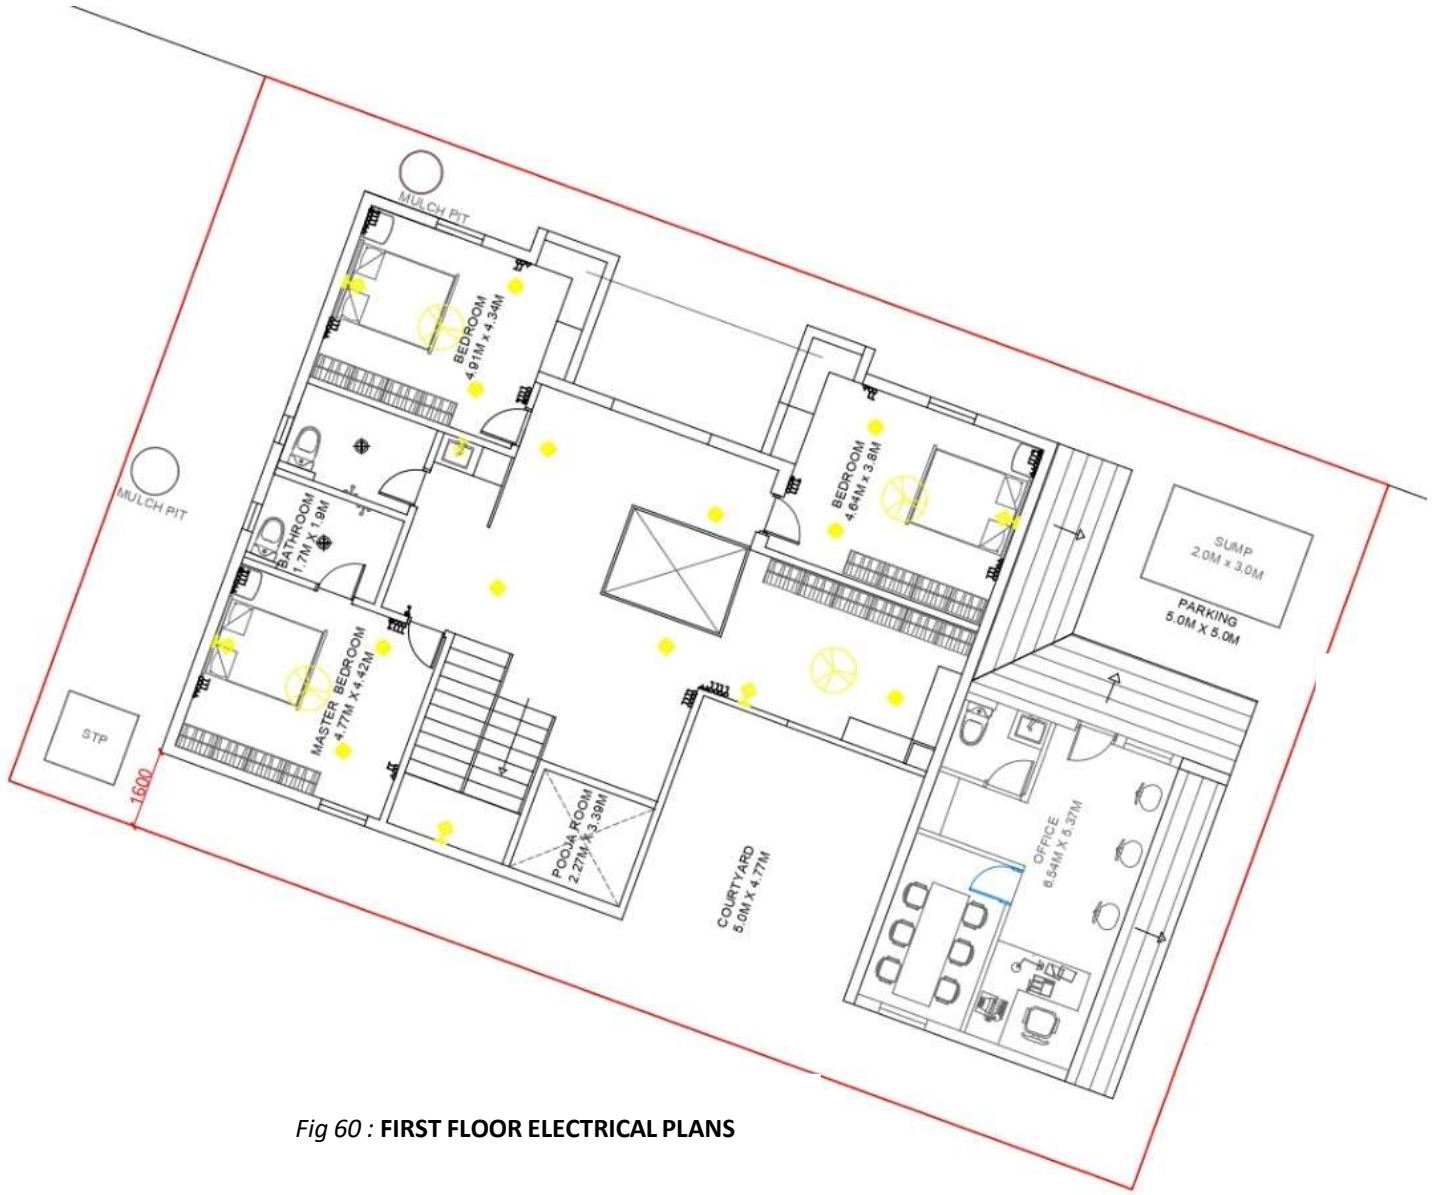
FIRST FLOOR ELECTRICAL PLANS
